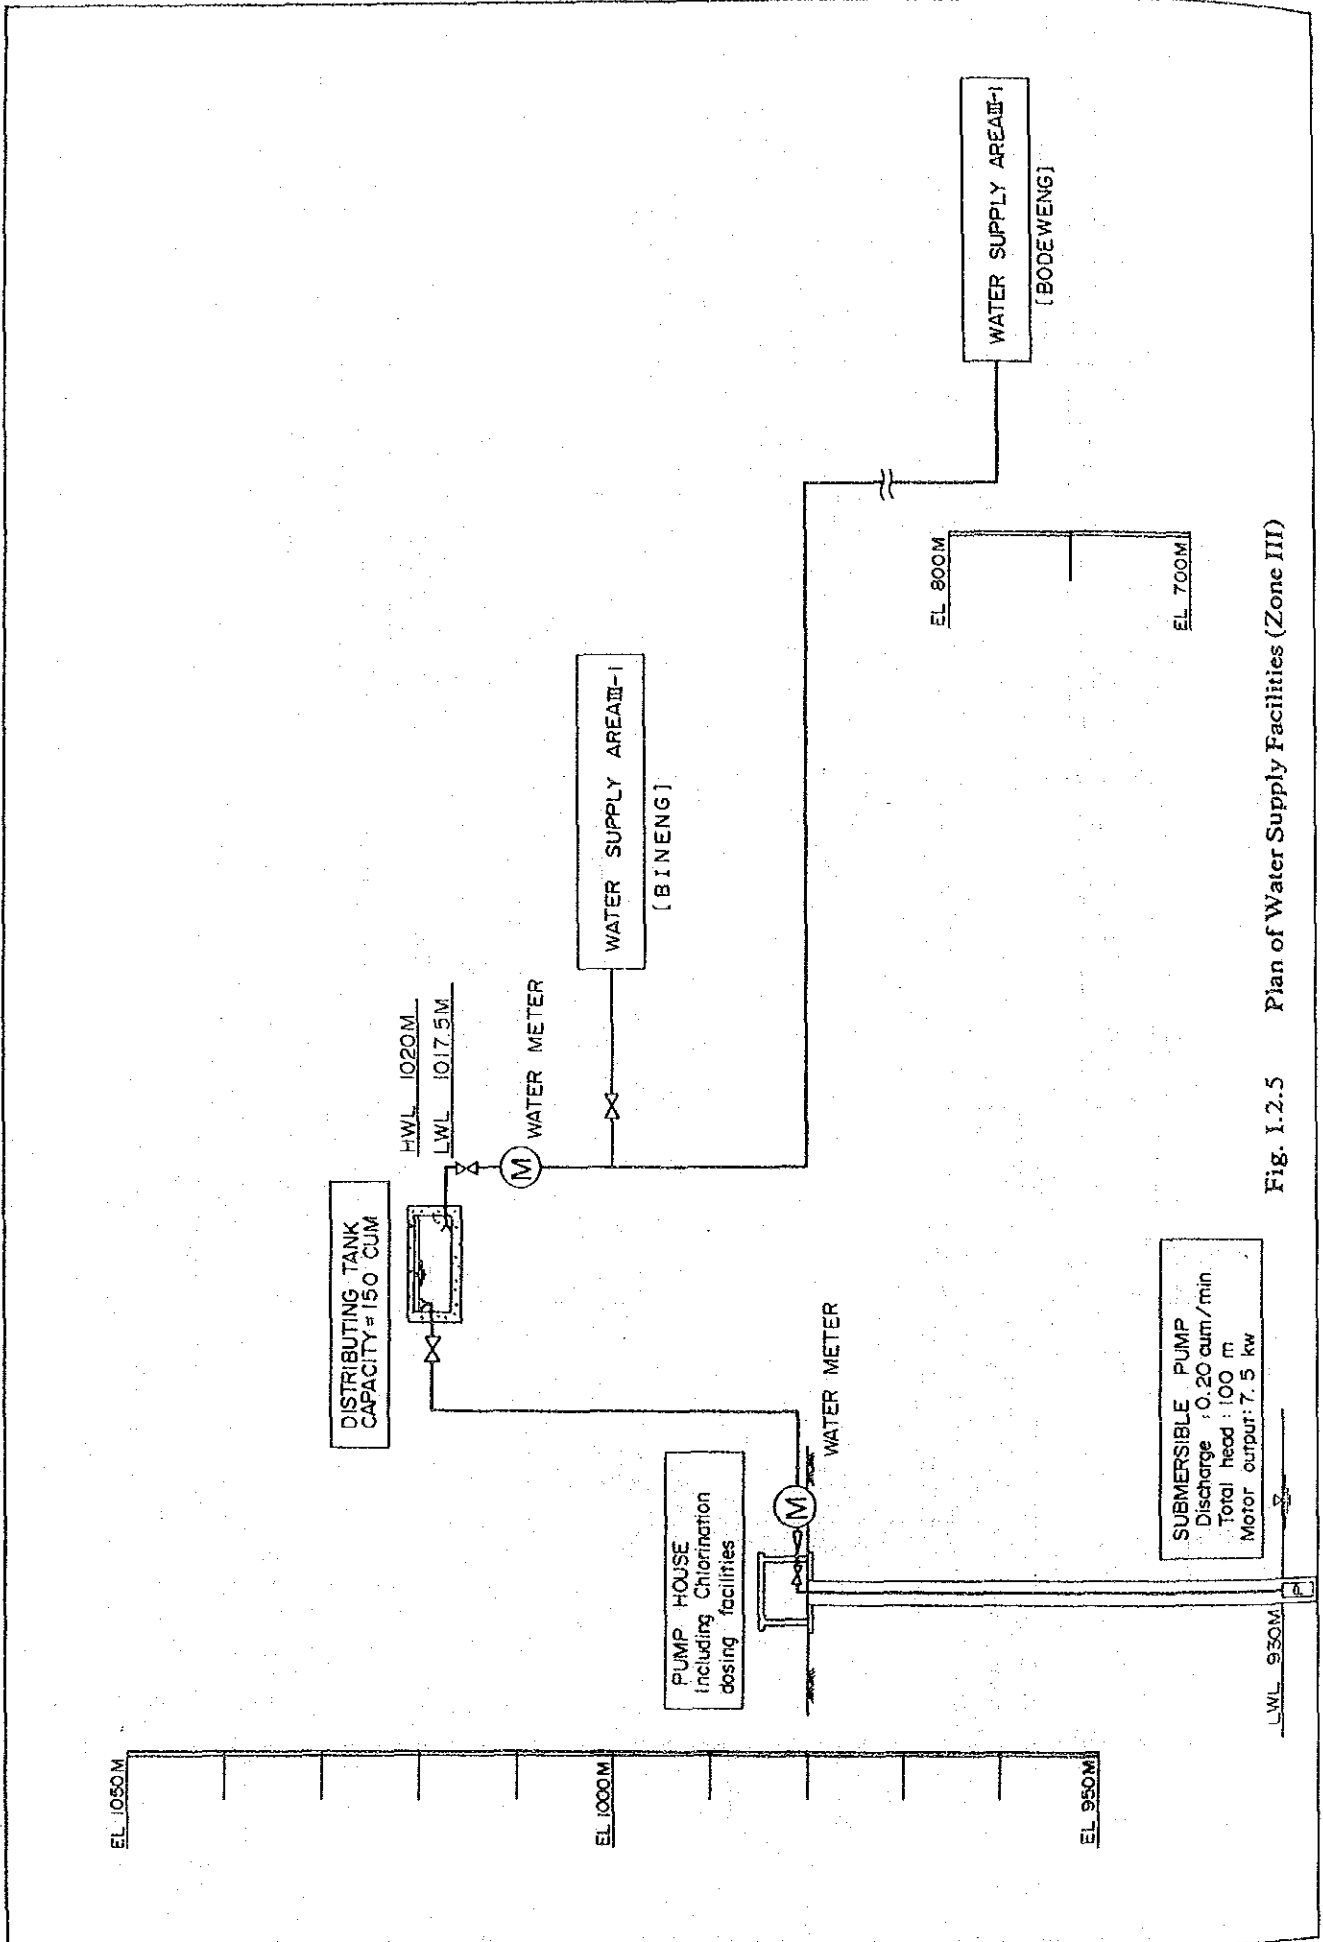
Plan of Water Supply Facilities (Zone III)
